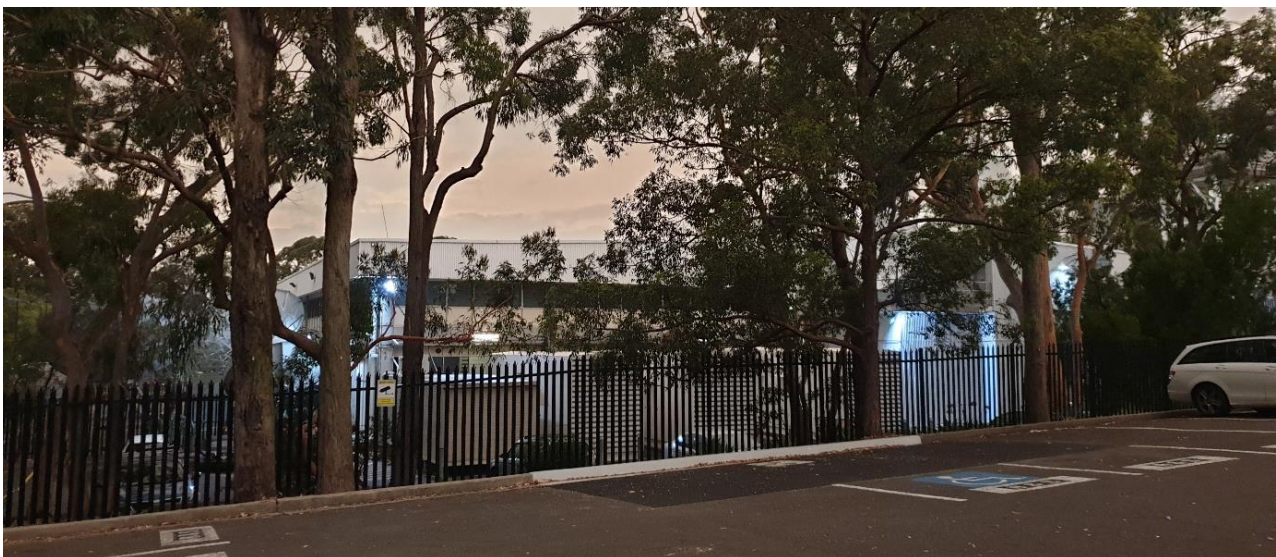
Adjoining site at No. 269 Lane Cove Road, viewed from within existing north-eastern side boundary
